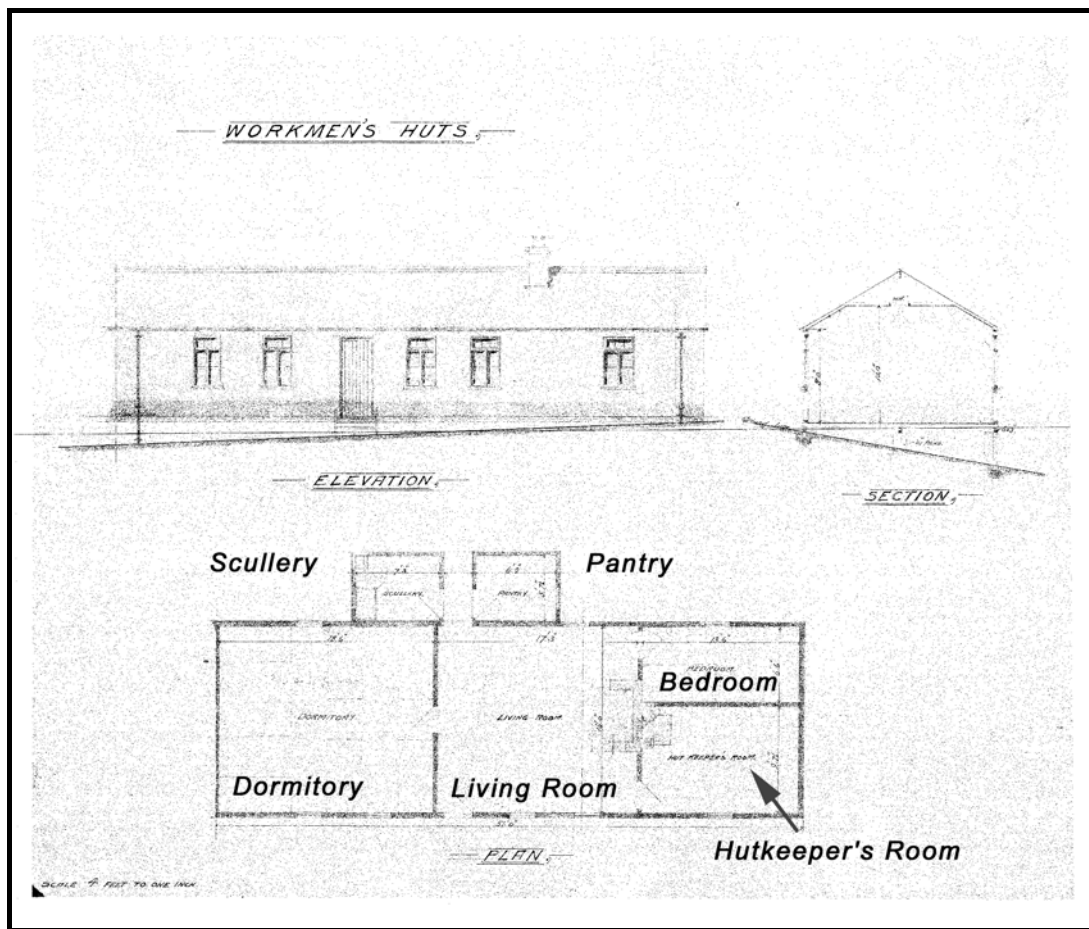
Plan and elevations of navy dormitory, Tin Town. From DVWB n.d.
